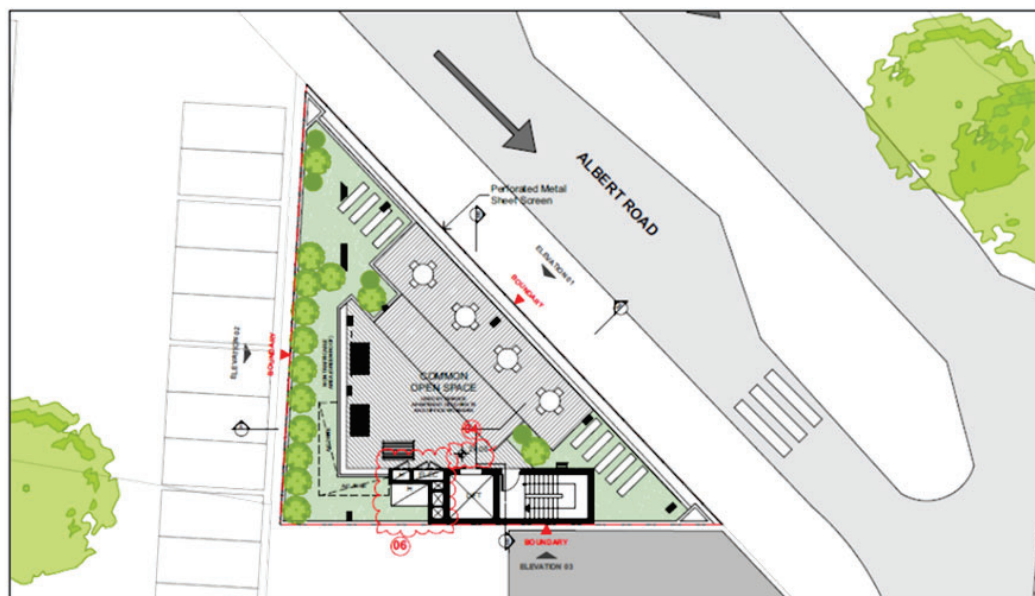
Proposed Level 5 Floor Plan (Communal Open Space Area).
